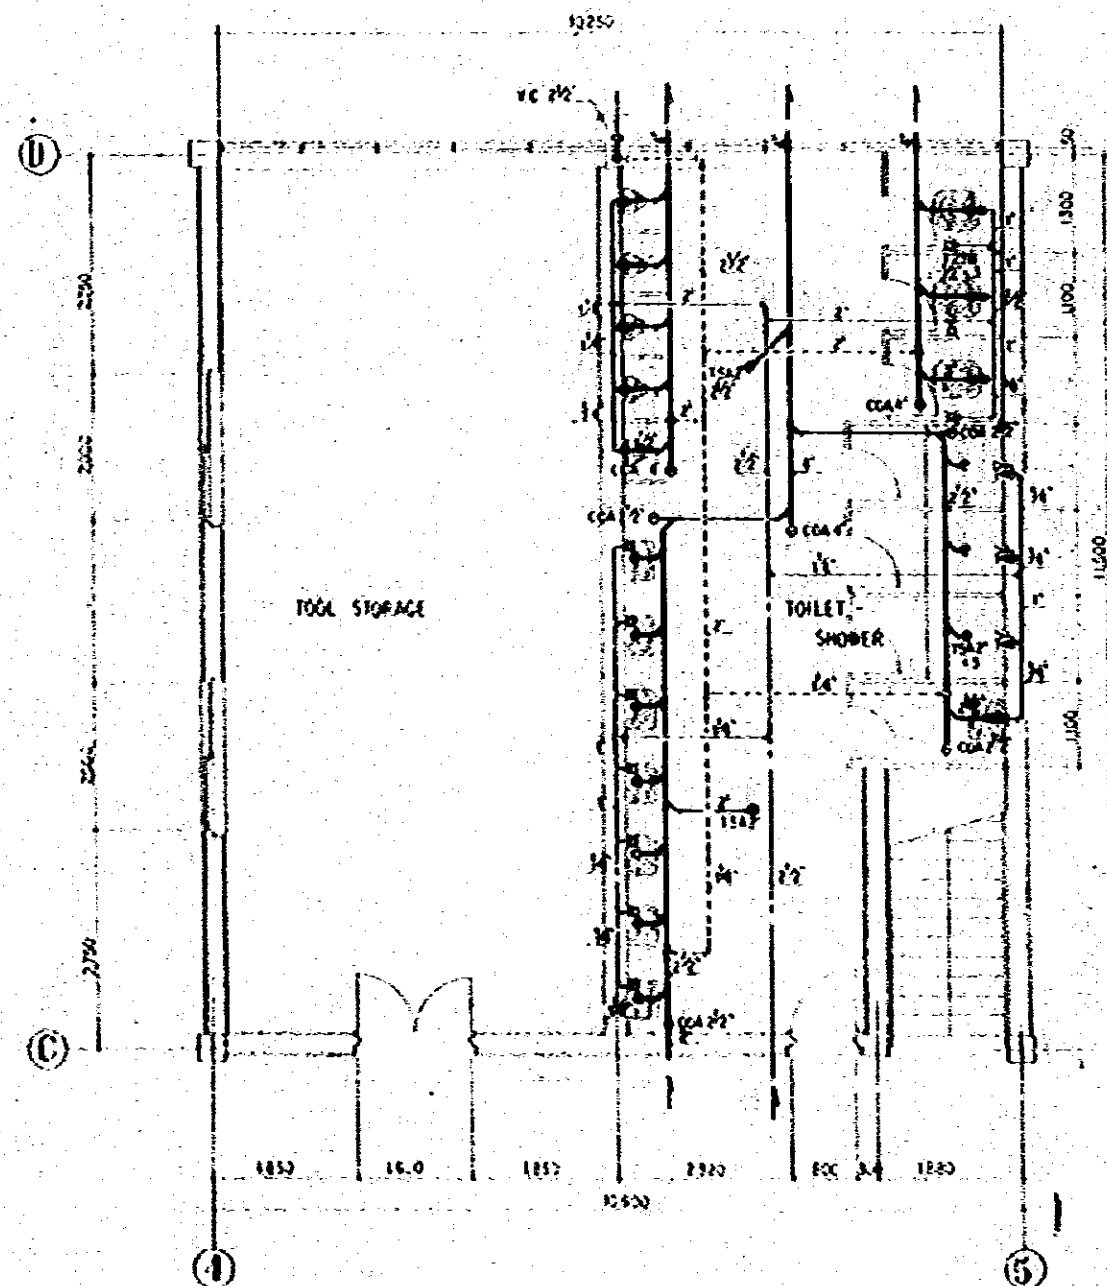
ST FLOOR TOILET S-1-50
